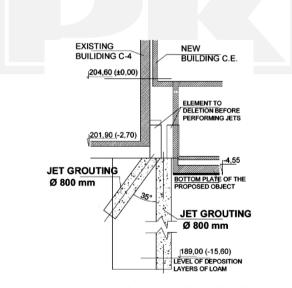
Cross-section of the foundation of buildings C-4 and C.E
